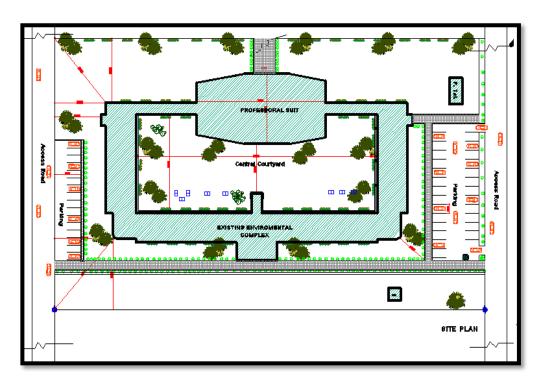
Plate XL: Site plan, department of Architecture, Federal University of Technology Minna, Nigeria
